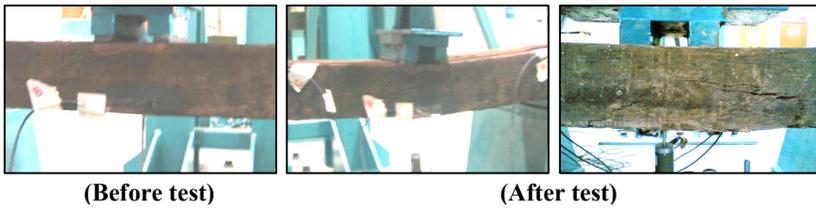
Crack Patterns for CPM2 – Longitudinal and Radial Crack.
